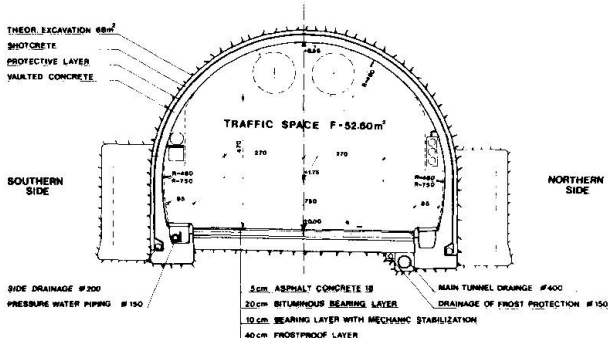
Tanzenberg Tunnel, Southern Tube Standard Cross-Section with Bays
